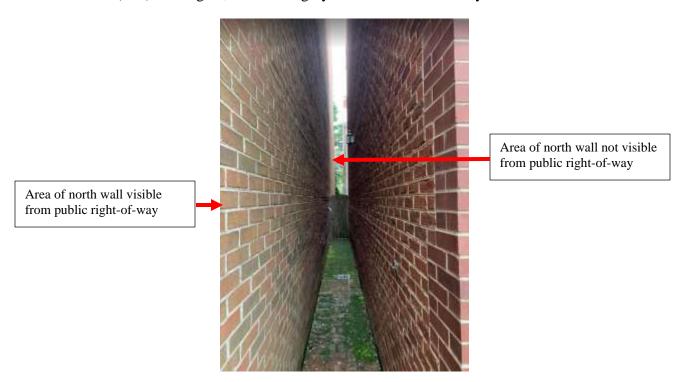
The space between 613 South Royal Street and 611 South Royal Street measures 28.5 inches.
